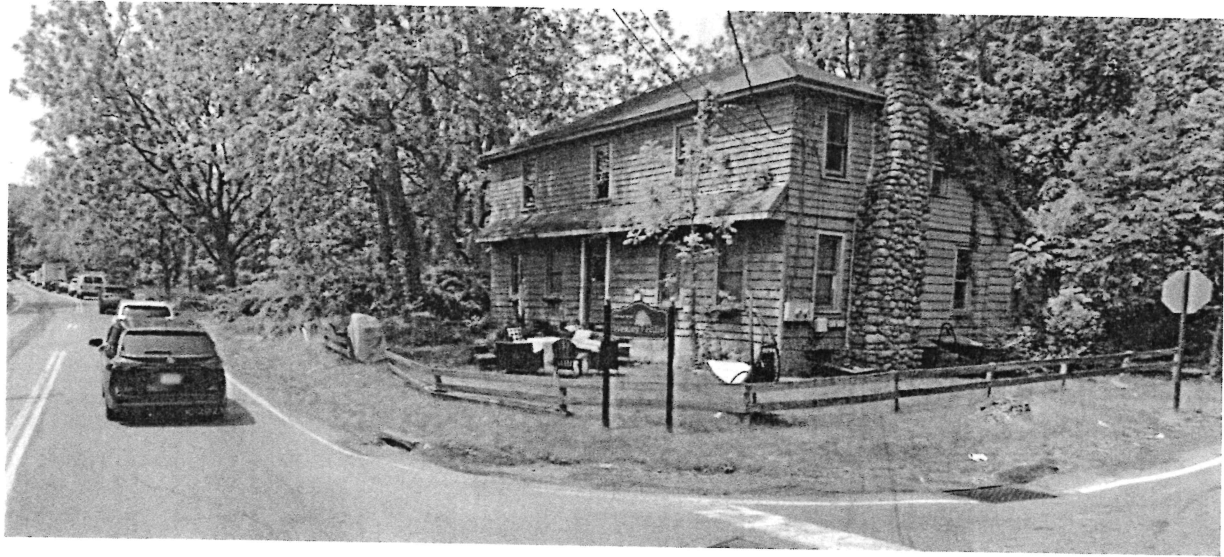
Intersection of New Hempstead Road and McNamara Road – Note heavy traffic on New Hempstead
